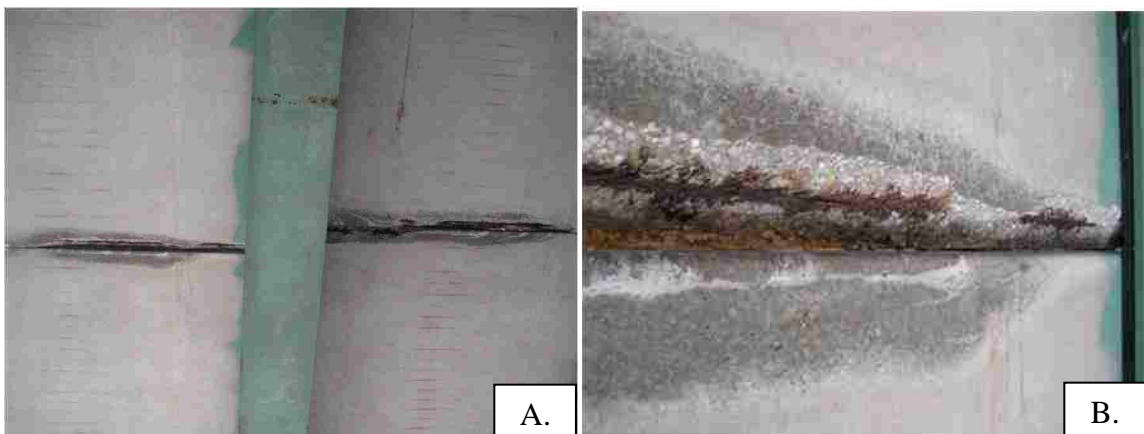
Spalling, efflorescence, water staining and rust stains observed in PPC panels (A. Adjacent panel joints, B. Close-up shot of one panel joint) (Bridge A4704)
